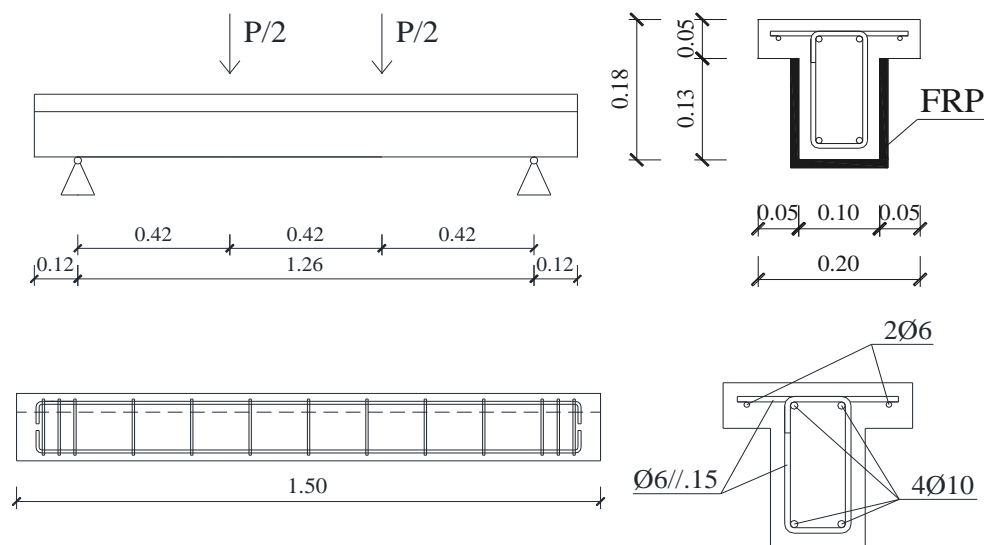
Beam specimens tested at the UCL concrete lab (dimensions in meters)
